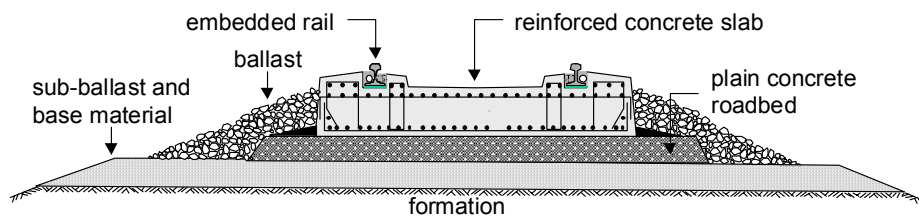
Typical Embedded rail Structure with conventional (UIC54) rails
